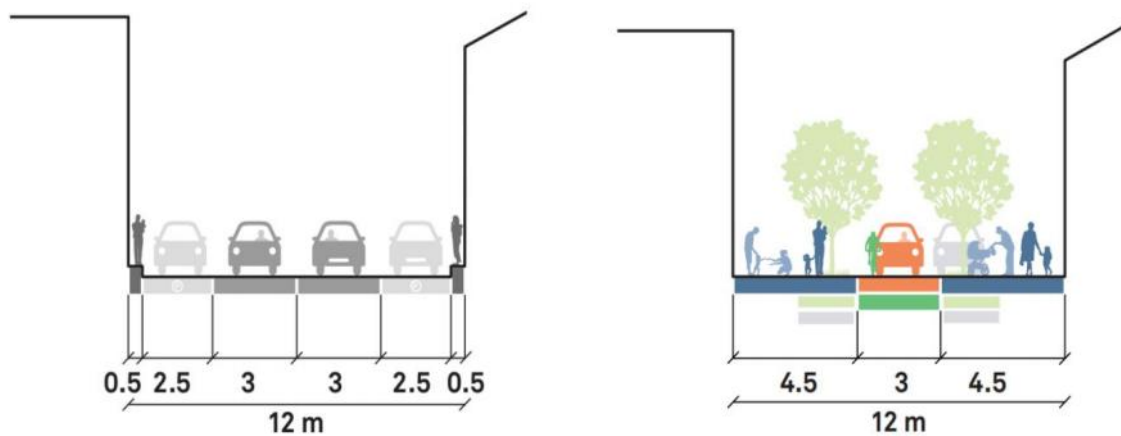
Widen the existing sidewalk to ensure continuity (Drawn by author)
